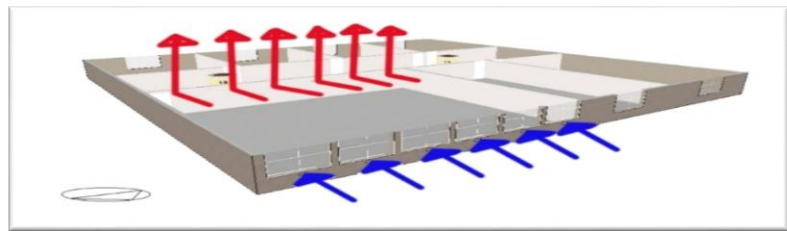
307 studio Architecture floor without applying cross-section of the air outlet /chimneys first drawn in the Energy Plus software (Tohidi,2020).
